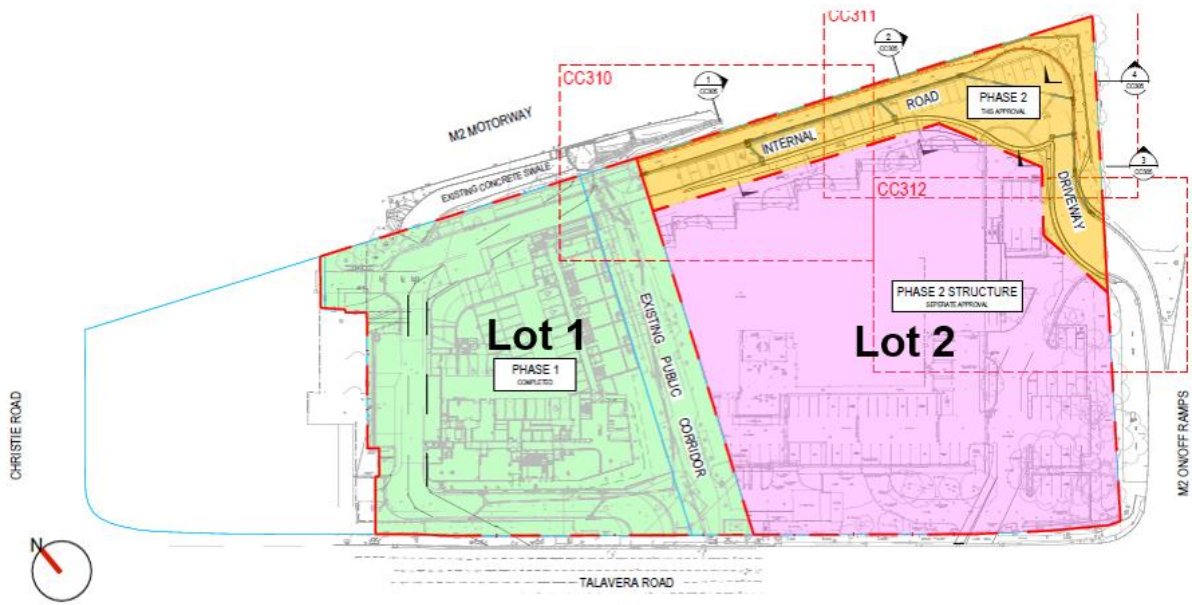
Extract from a plan approved in LDA2021/0071 for construction of the internal road (yellow). The completed Stage 1 development is to the left (green). The land the subject of this DA for Stage 2 is to the right (pink and yellow).
